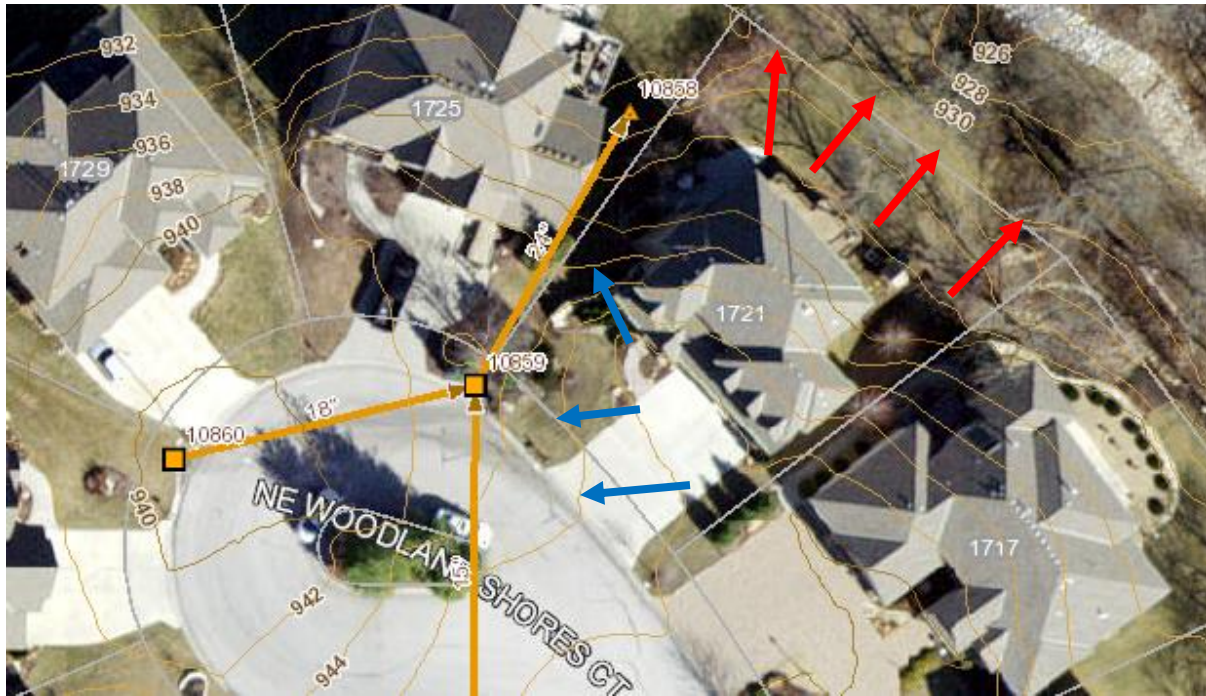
Existing lot drainage (front yard -- blue; back yard -- red)
